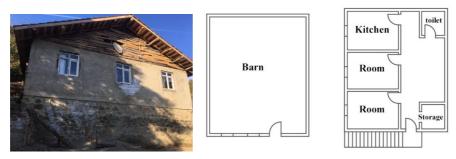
Mavga Highland Dwellings (Aydın, 2022), ground floor and first floor plan (drawn by the author)
